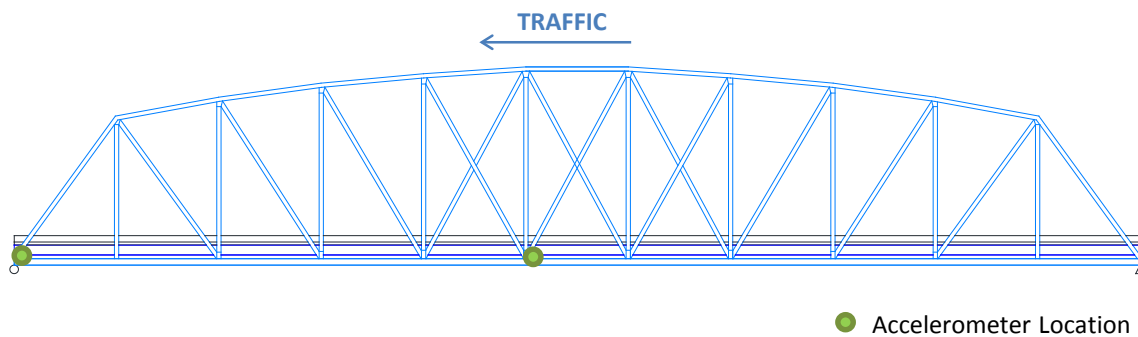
Elevation view of the northbound I-5 Columbia River Bridge showing accelerometers locations (brace sensor not shown).
